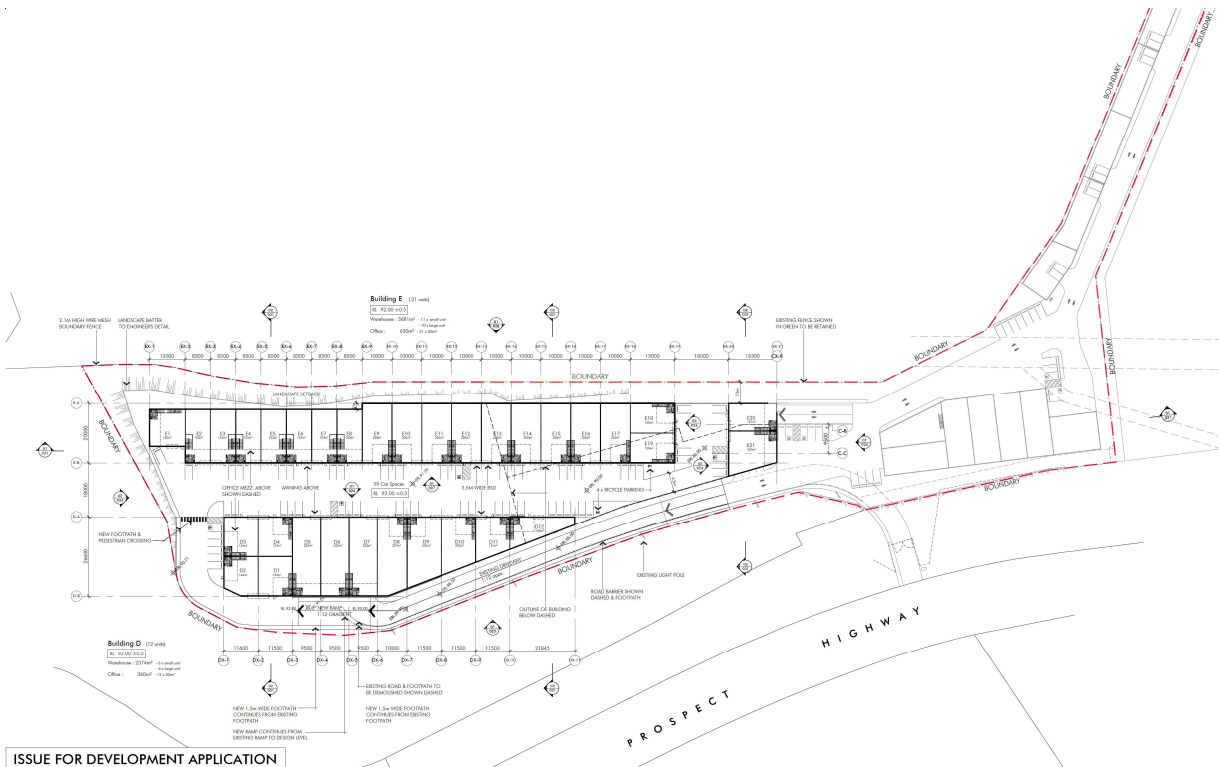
Upper Ground Floor Plan (Source: Nettleton Tribe)
